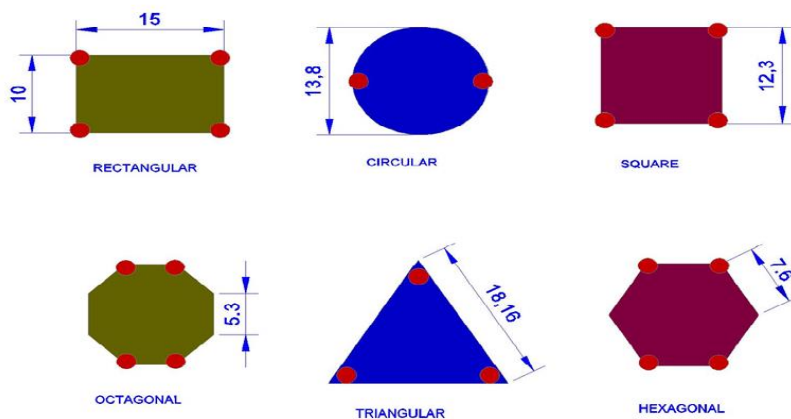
DIMENSION OF FOOTING SPECIMENS IN MM
